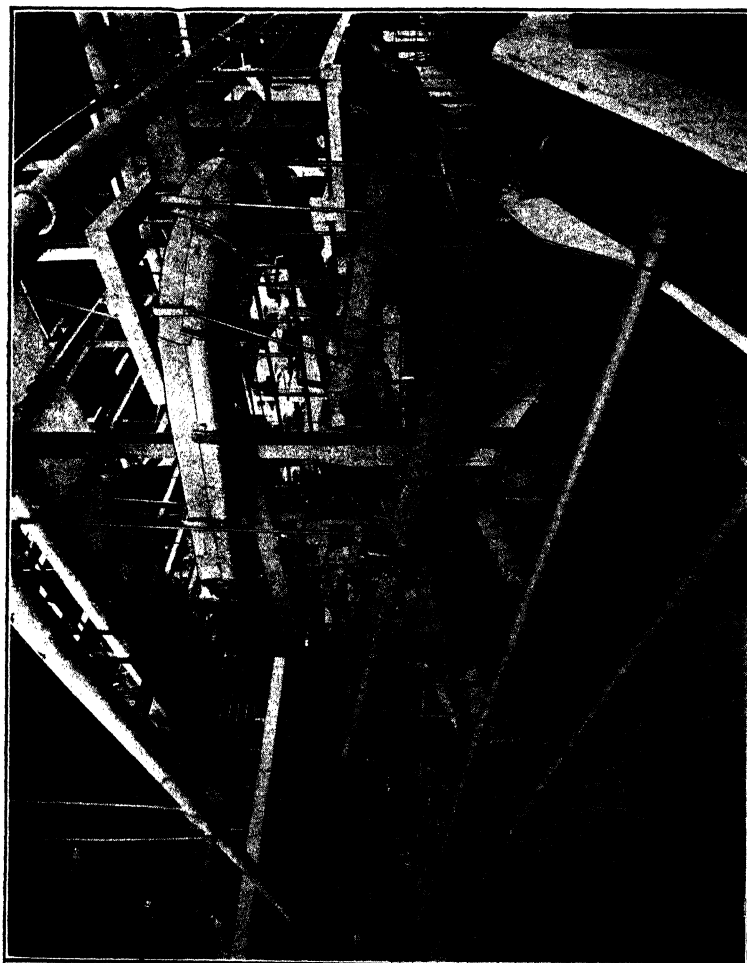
INTERIOR OF PART OF LOREE BREAKER OF HUDSON COAL CO., SHOWING A SPIRAL CHUTE
